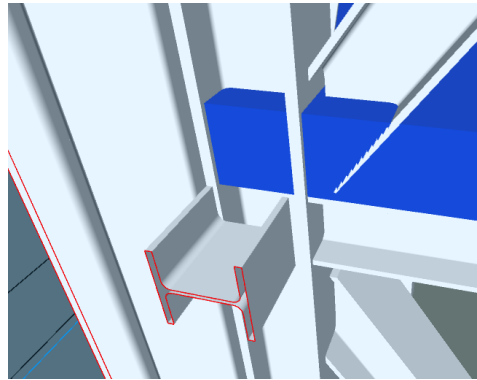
Modeling detail- wall section: interface of wall and floor structural elements are not modeled. (Retrieved from 3D model, Witteveen+Bos, 2019)
